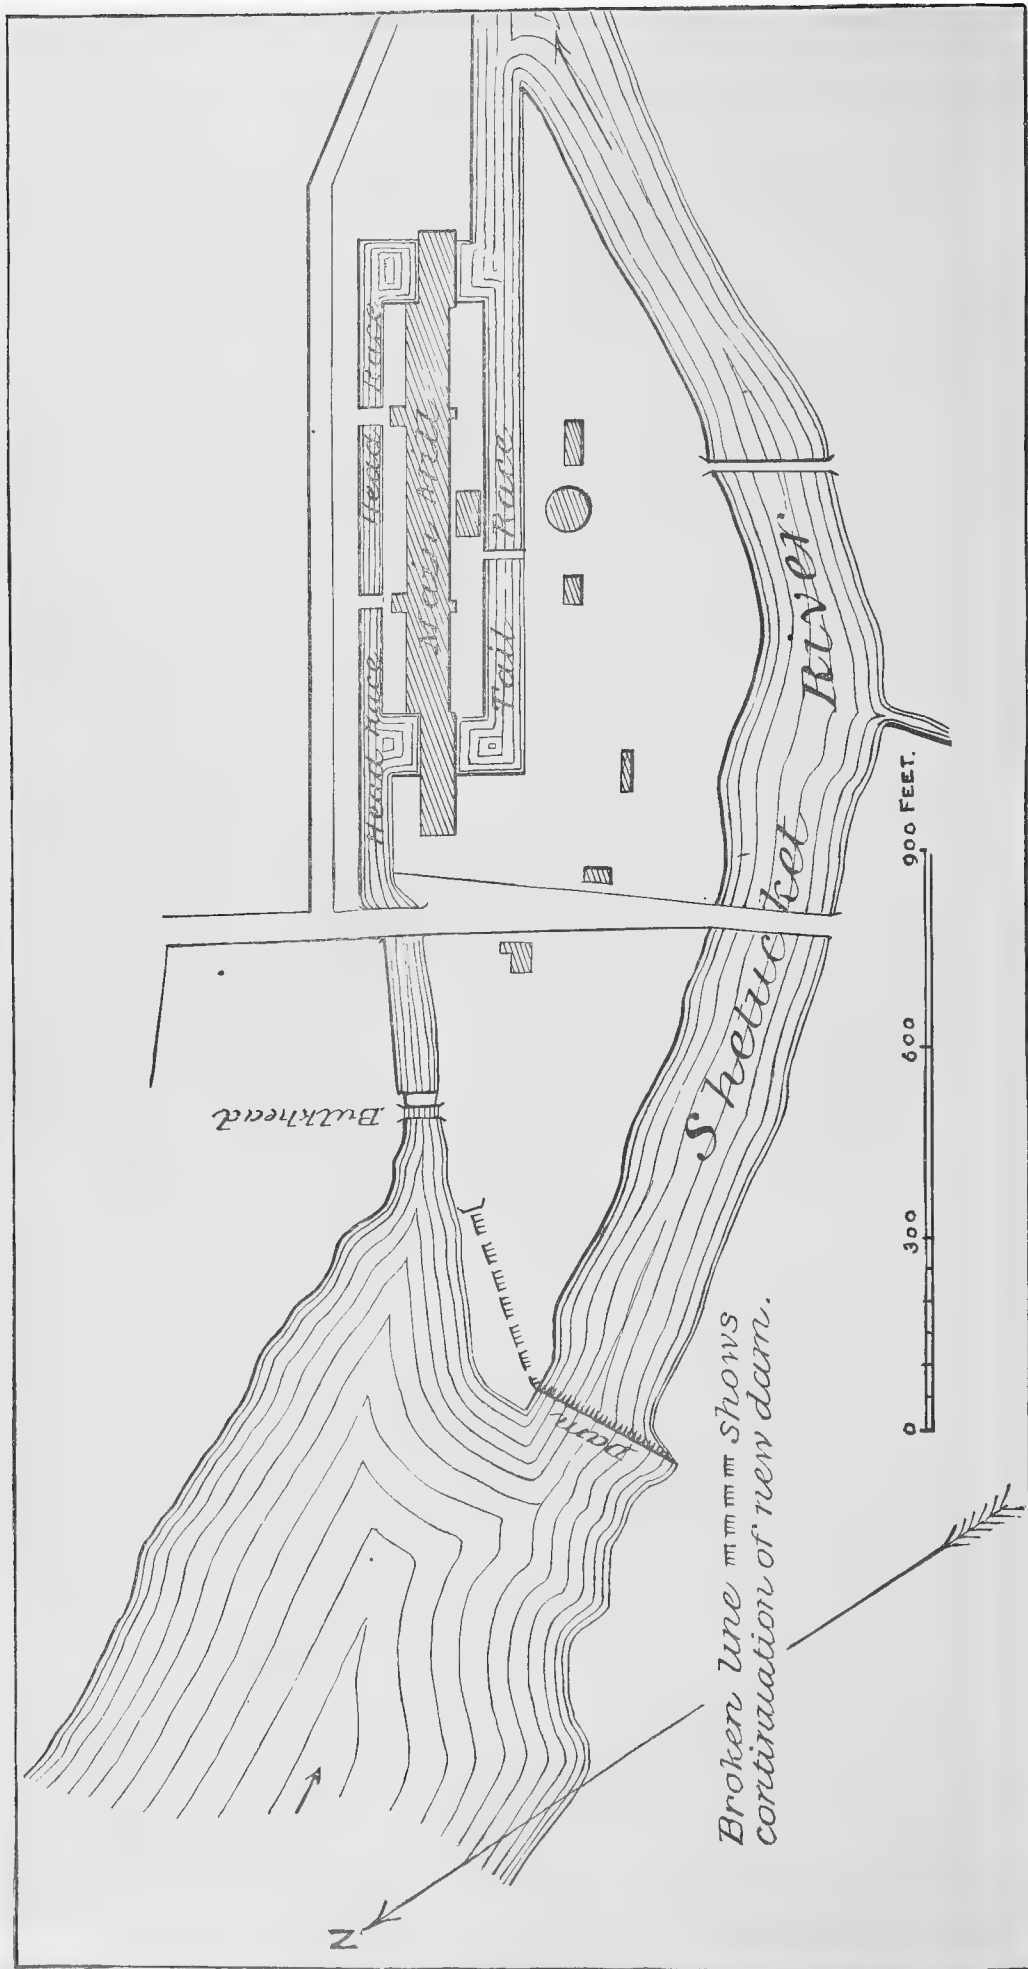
Plan of Baltic Privilege previous to the failure of the dam.
